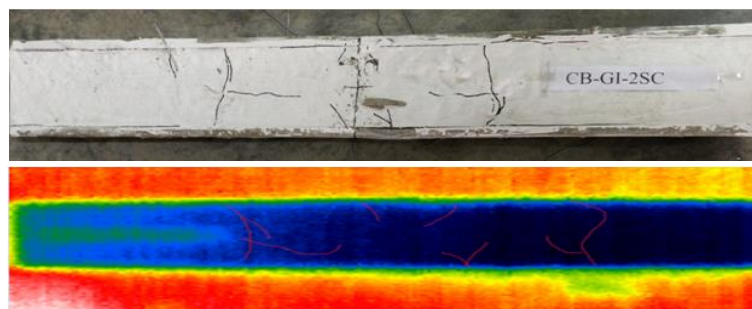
Specimen CB – GI – 2SC after testing (Mobile IR Camera).
